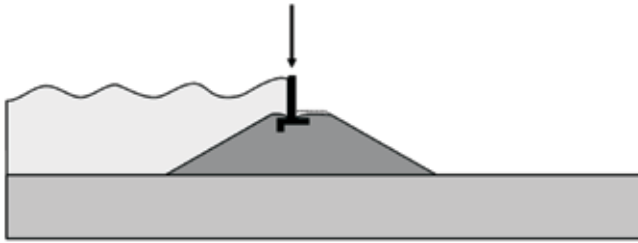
Settlement inside a levee due to overloading by a wall on the crest (courtesy Y Deniaud, CETMEF)
